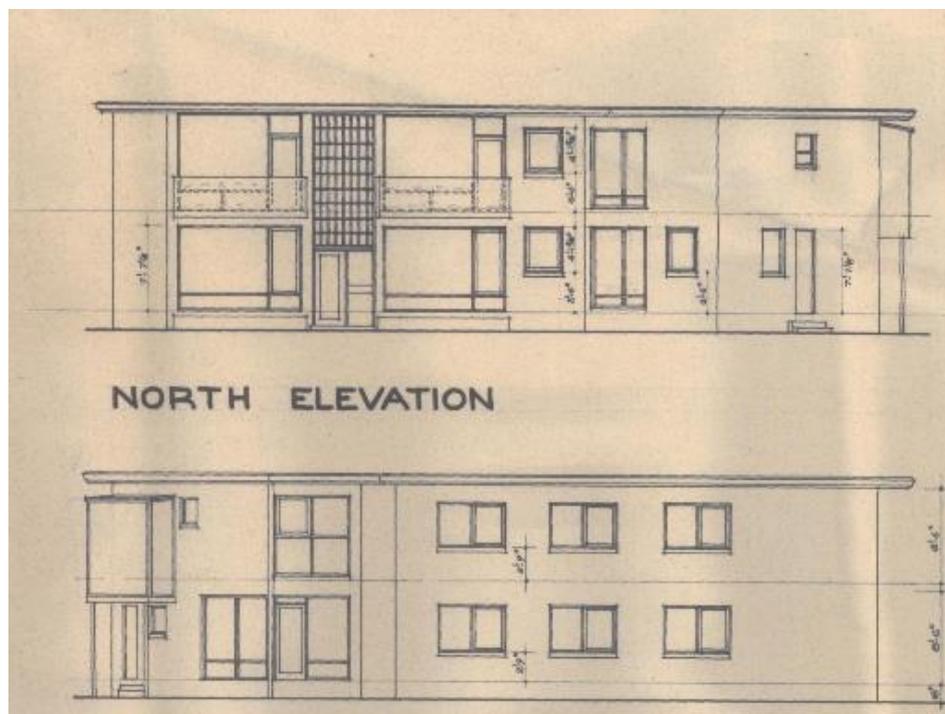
North and south elevations of the west block. (Source: City of Boroondara)
